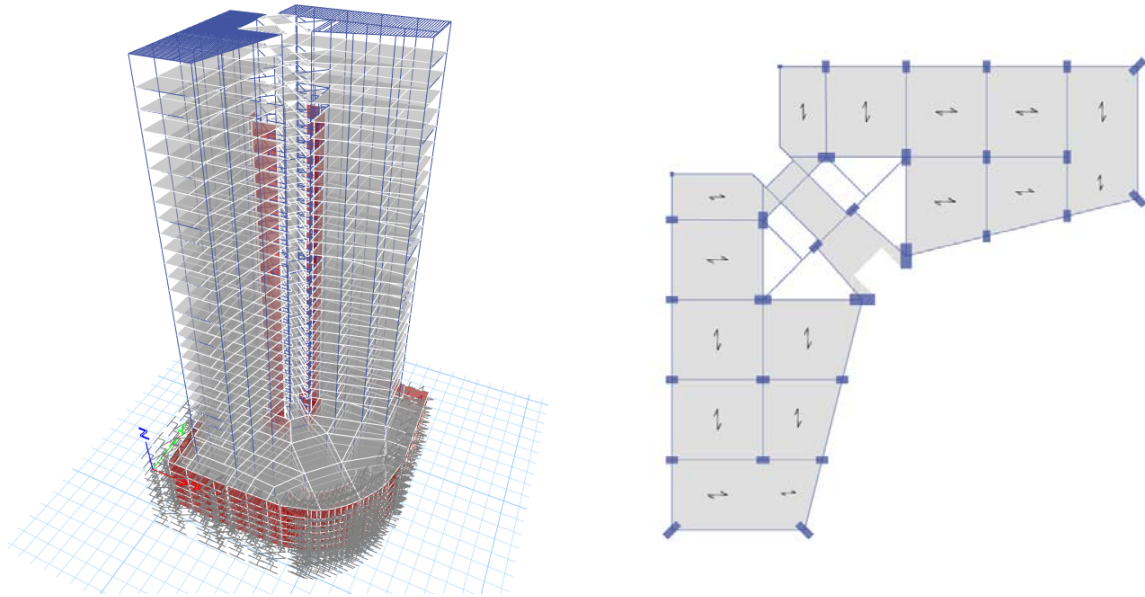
Case of study A. Isometric view of the building (left); plan view of the building (right)
